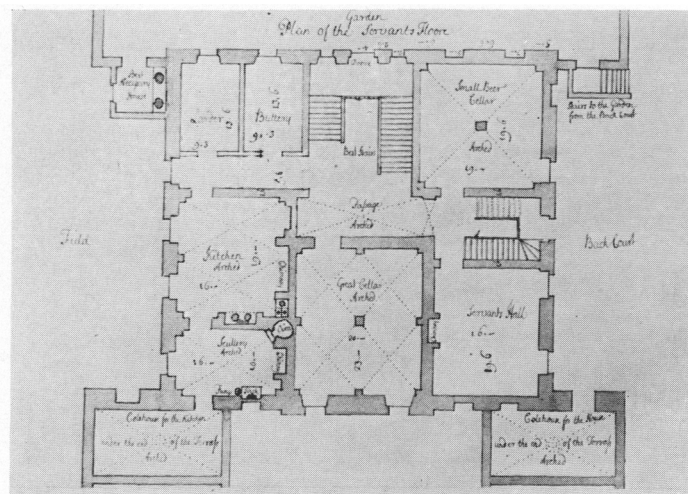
House at Henbury for Mr Fane, basement plan [63]
